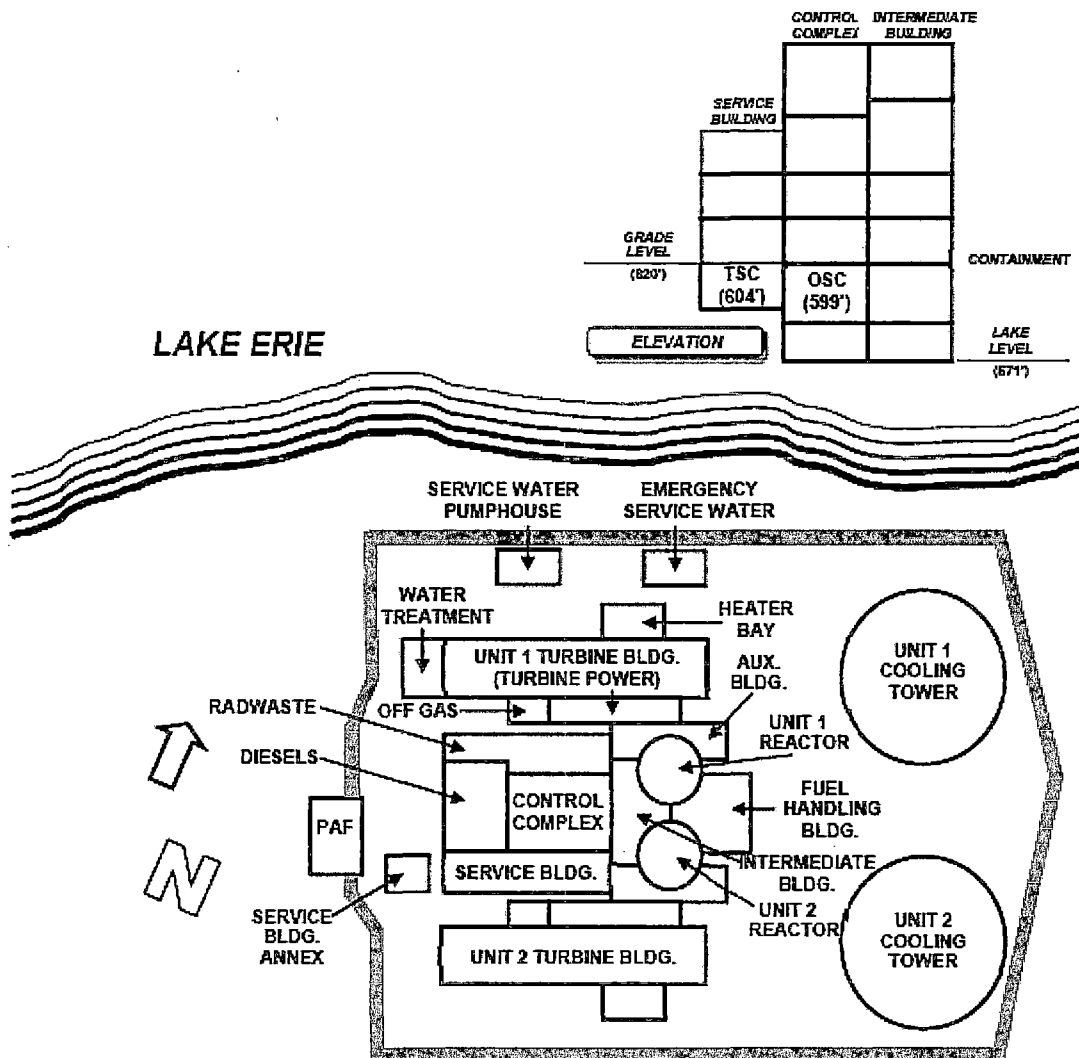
TECHNICAL SUPPORT CENTER (TSC) LAYOUT
